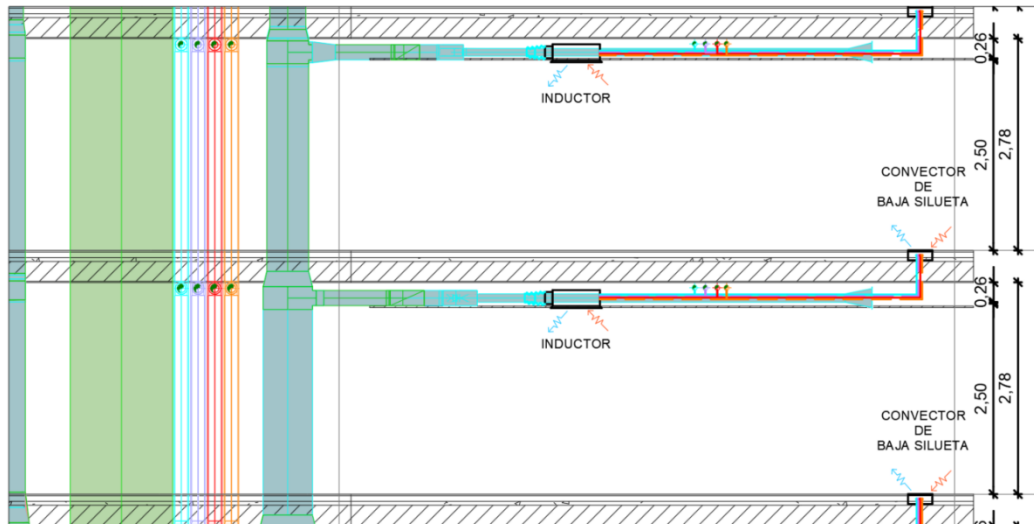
Plan section of standard plan, alternative 4 (source: AIGUASOL).
